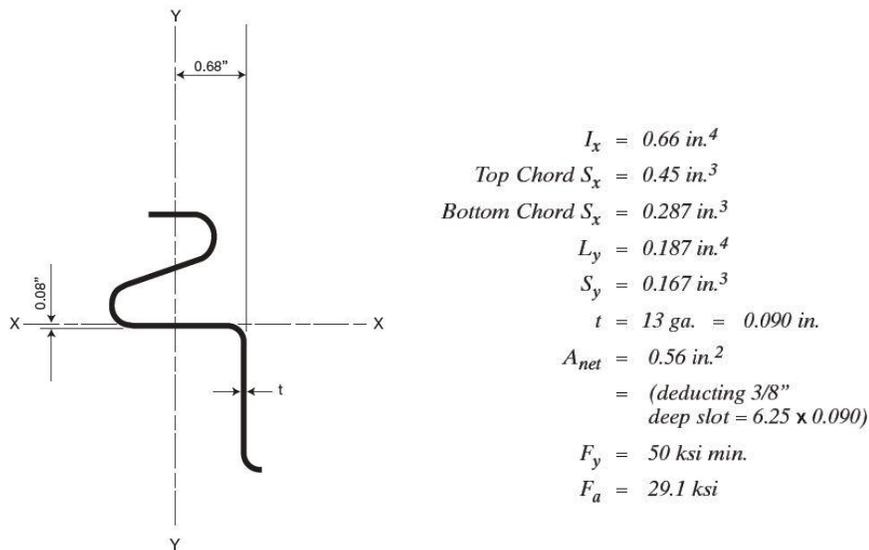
Top chord of the Hambro joist "s" chord with section properties.
